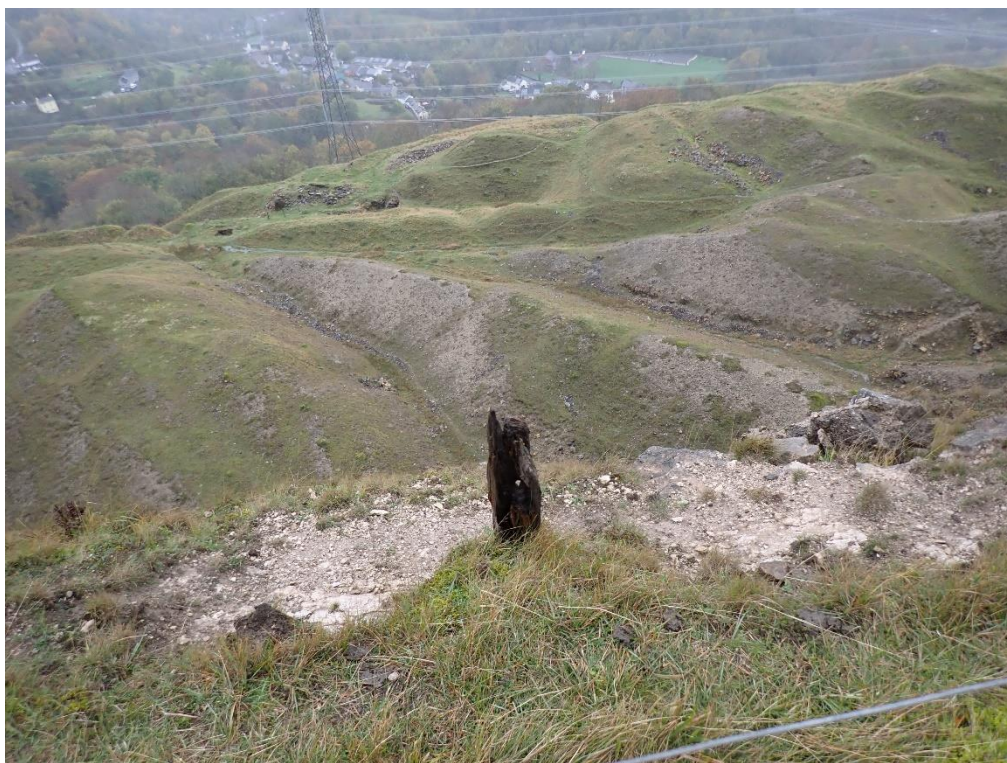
Chainage 135m, slip on slope below road close to carriageway.
